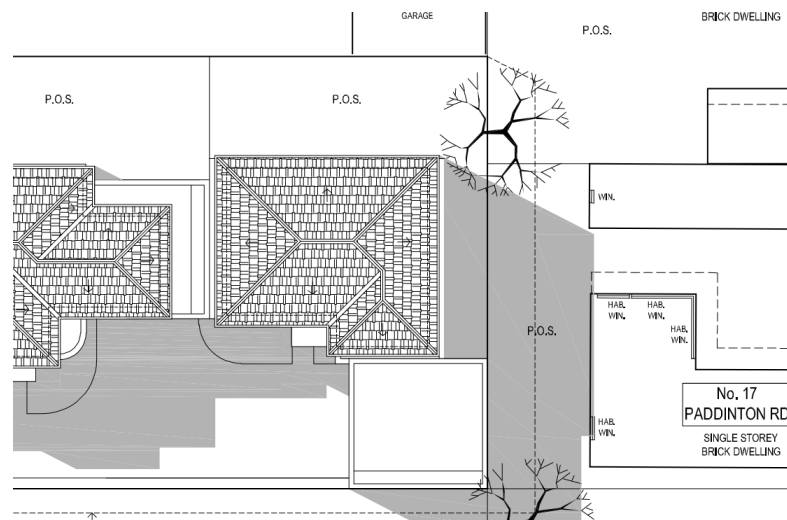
section of 3pm shadow diagram in application plans showing alignment of the proposed rear dwelling to the rear of 17 Paddington Road.
